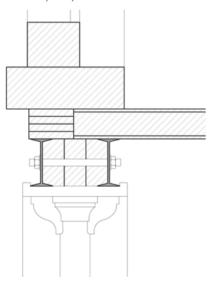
Construction detail – lintel support on column (Denfer 1894, p. 274 – redrawn).
